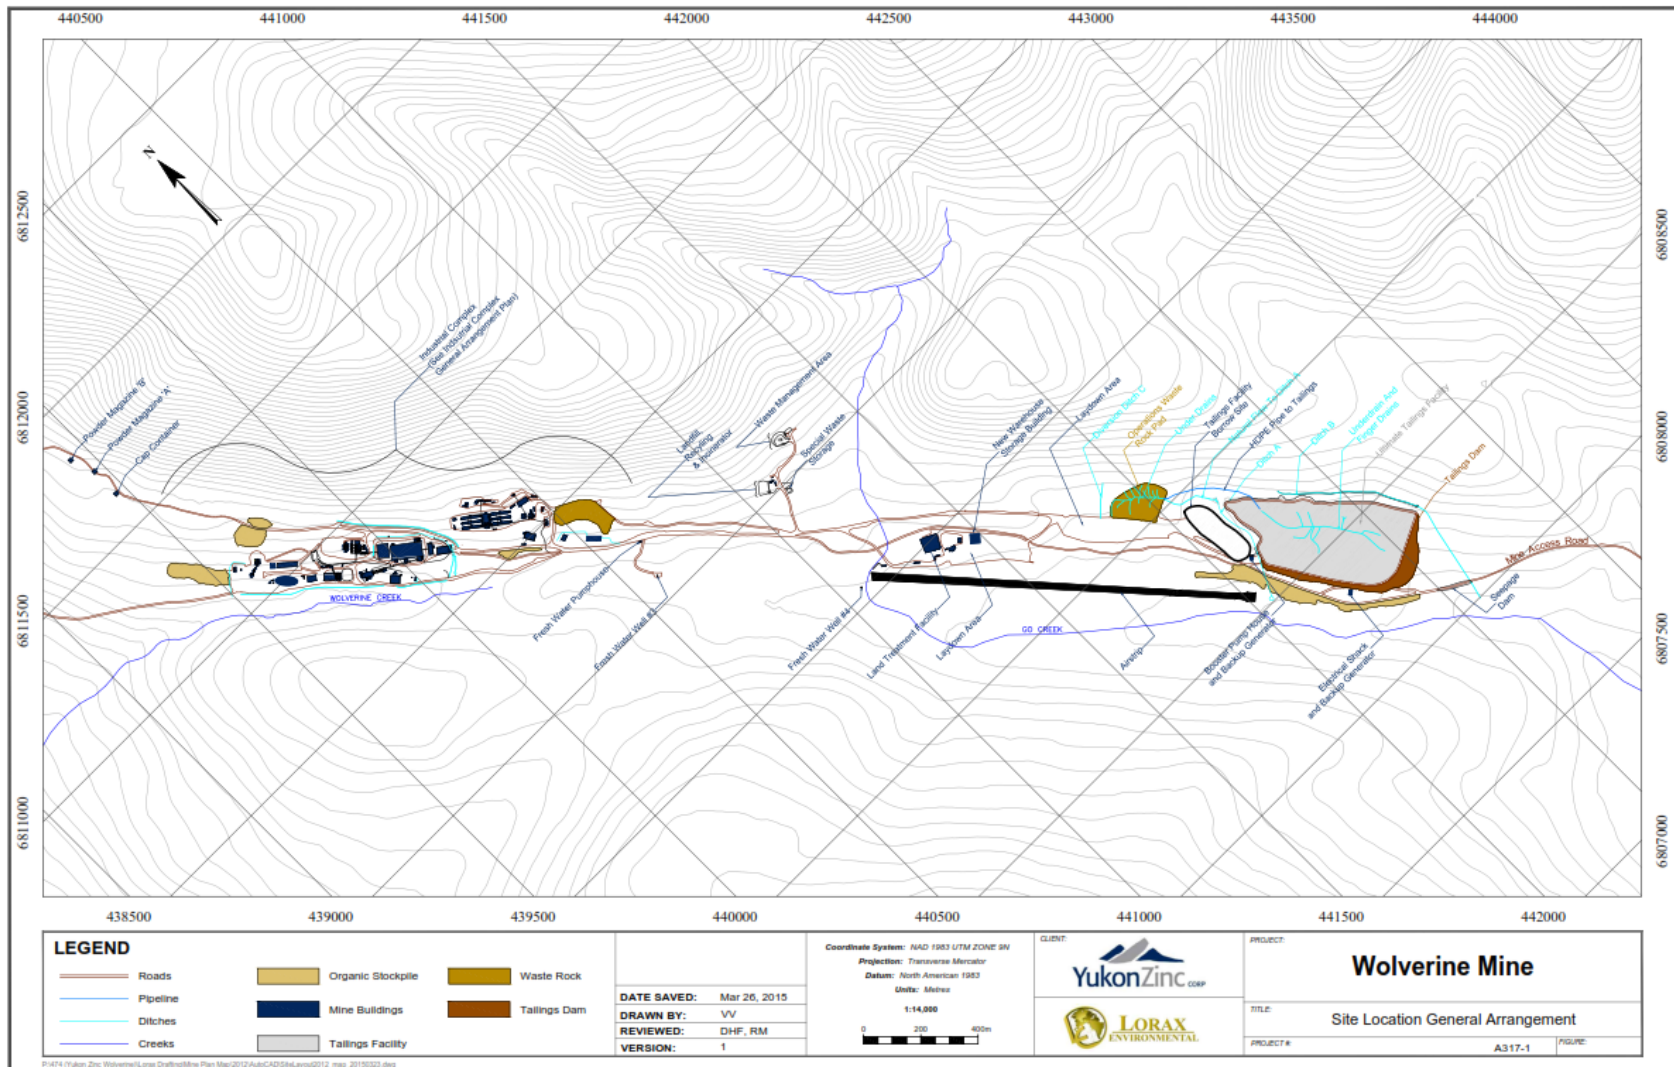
Wolverine Mine General Site Plan End of 2014
